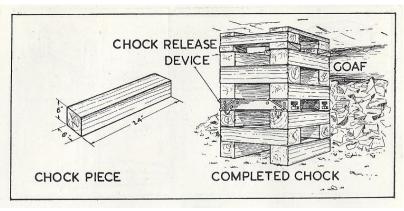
Wood Chocks Provided Additional Support to the Roof
